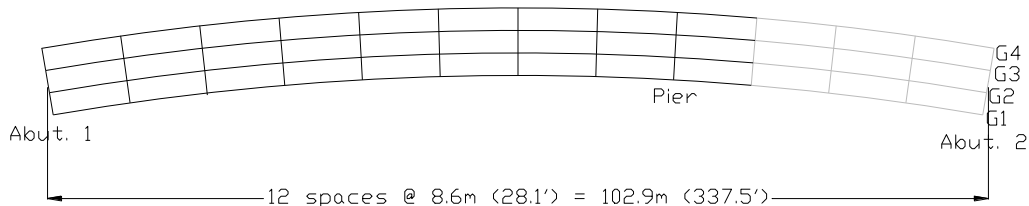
Stage 2 of Construction for Paired Girder (Inner Girders Placed First) Erection of Two Unequal Spans, 4-Girder, 305-m (1000-ft) Radius Bridge.
